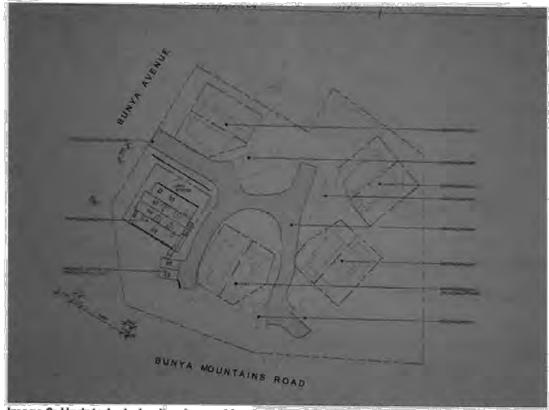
Updated whole site plan and layout of proposal (as provided in response to Council's information request)
